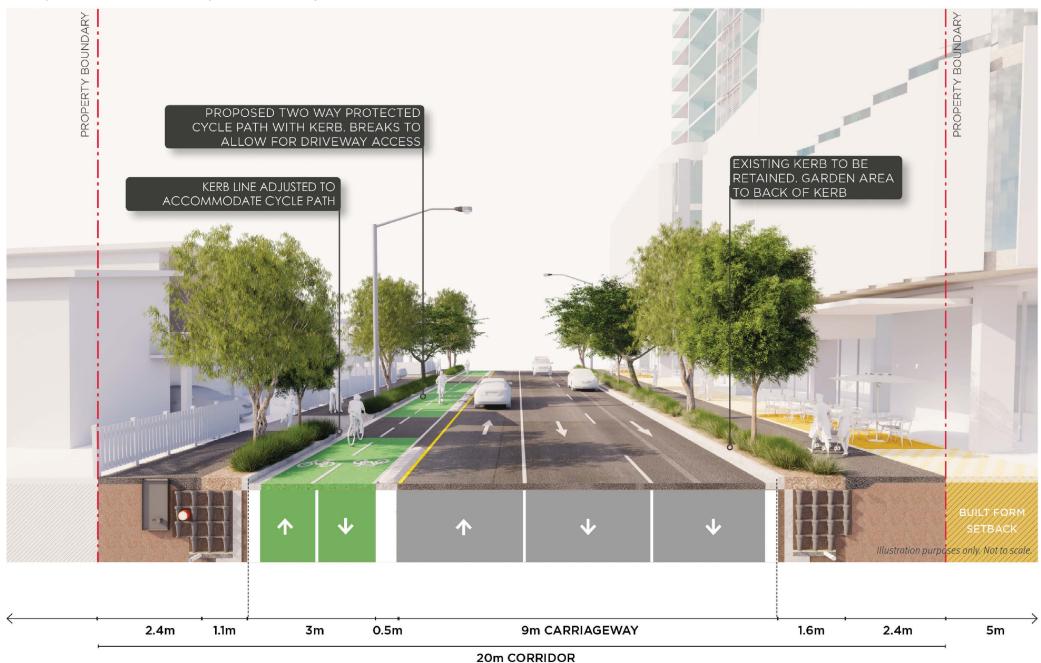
Cross section - Leopard Street - subtropical boulevard (minor)
